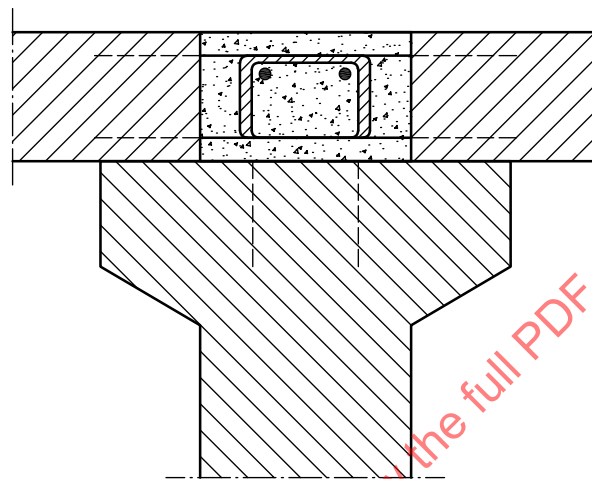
Floor-to-supporting beam cast-in-situ connection
